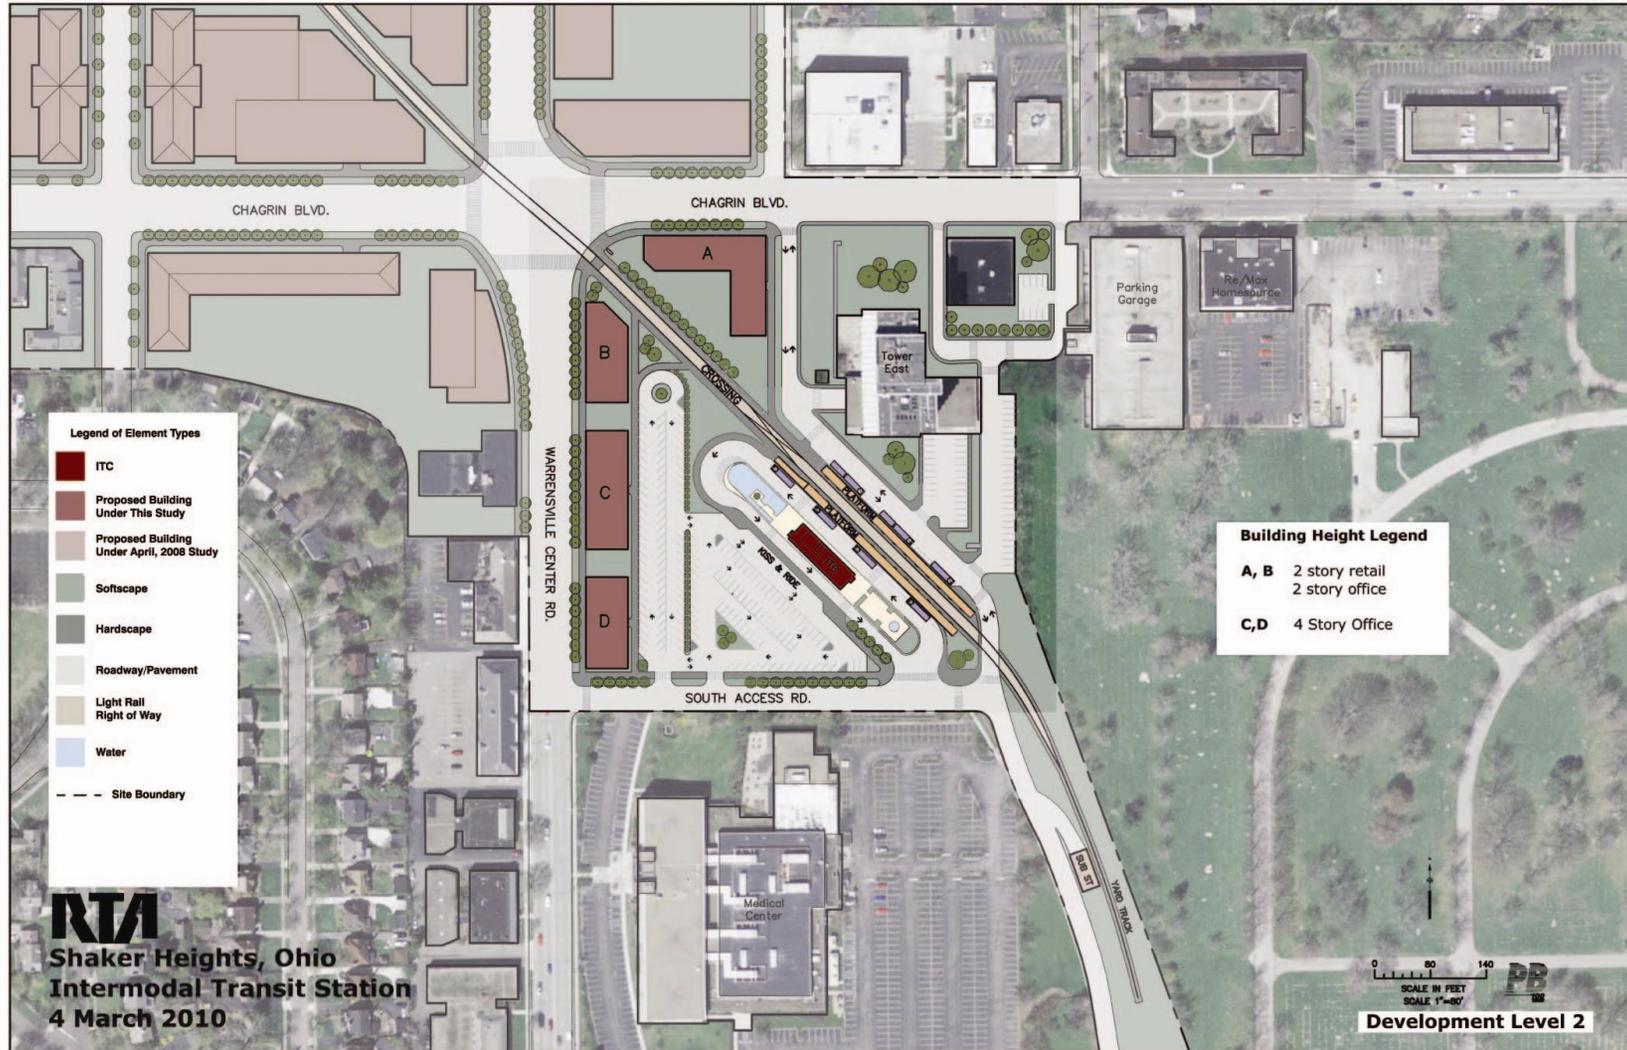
Development Level 2 Proposed Site Plan Concept
